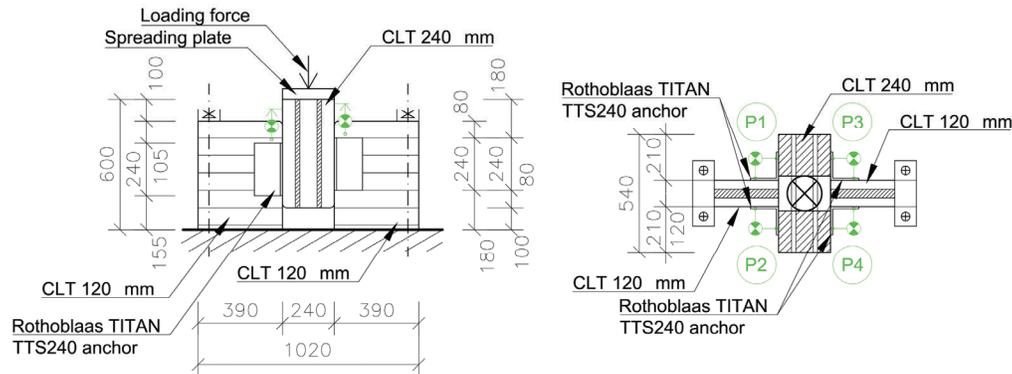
Loading test setup for shear brackets – side view (left) and plan view (right).
